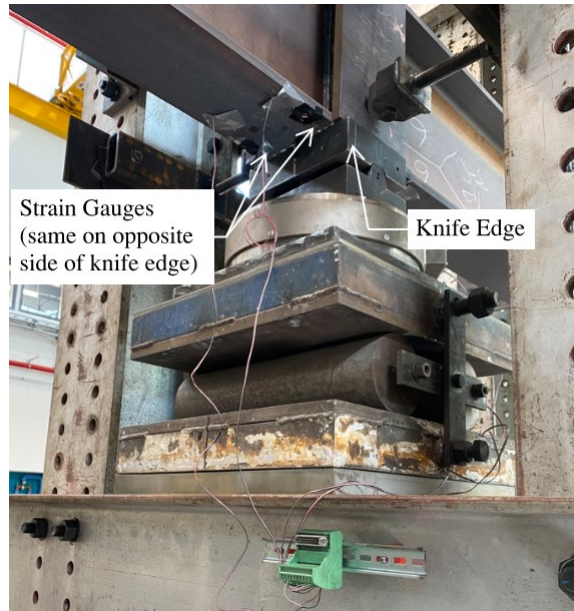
Strain gauges mounted to bottom flange at fulcrum support
